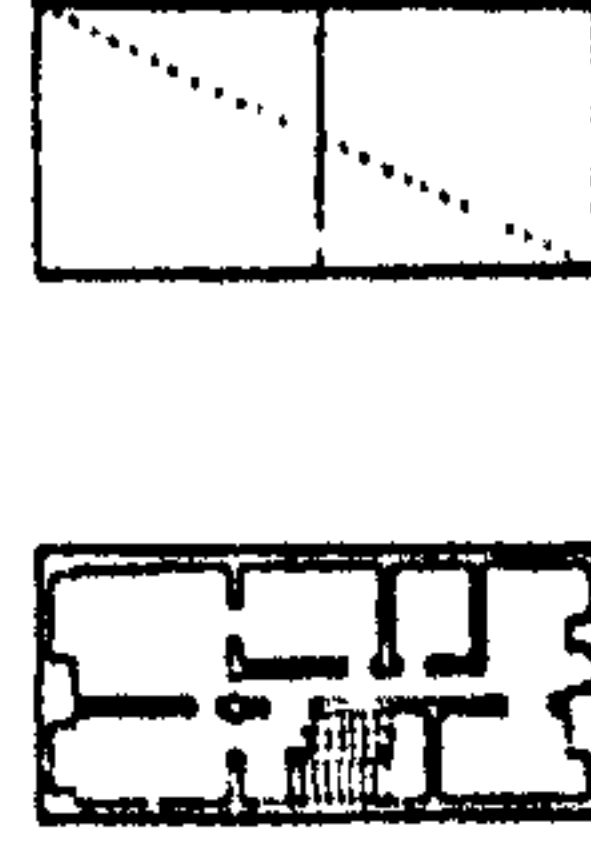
Plan of a two-window façade width building: double square: 177 Correios Street. (Drawing by Jorge Mascarenhas).
